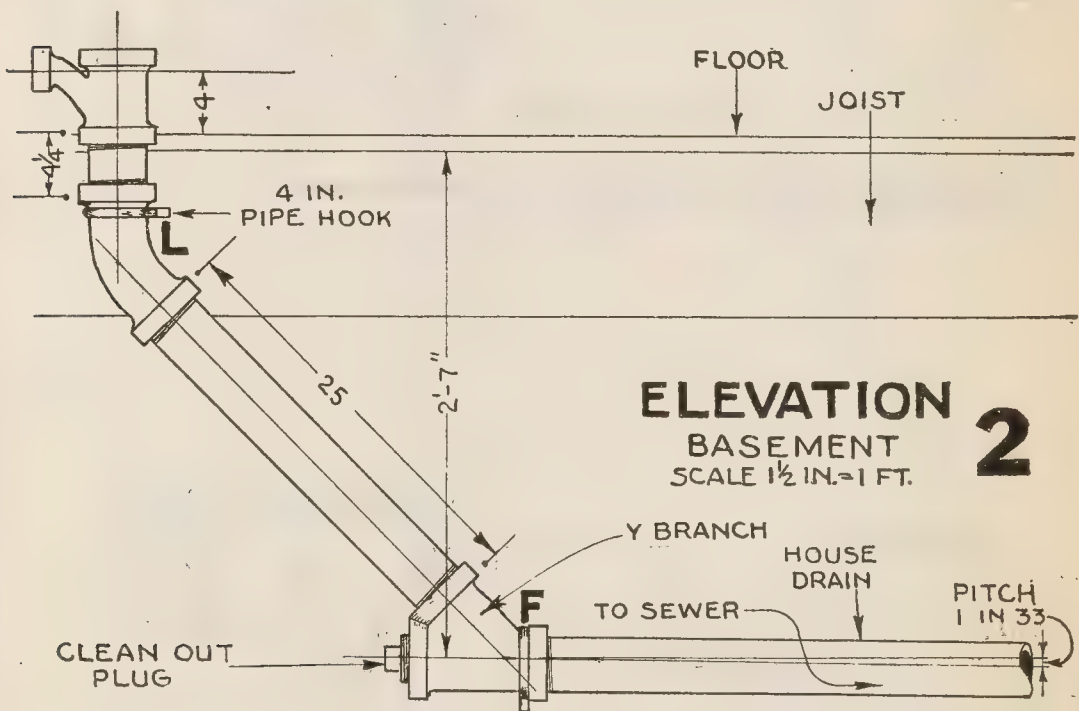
,981.—Elevation of roughing in for basement showing dimensions with wrought pipe and recessed screwed fittings.
